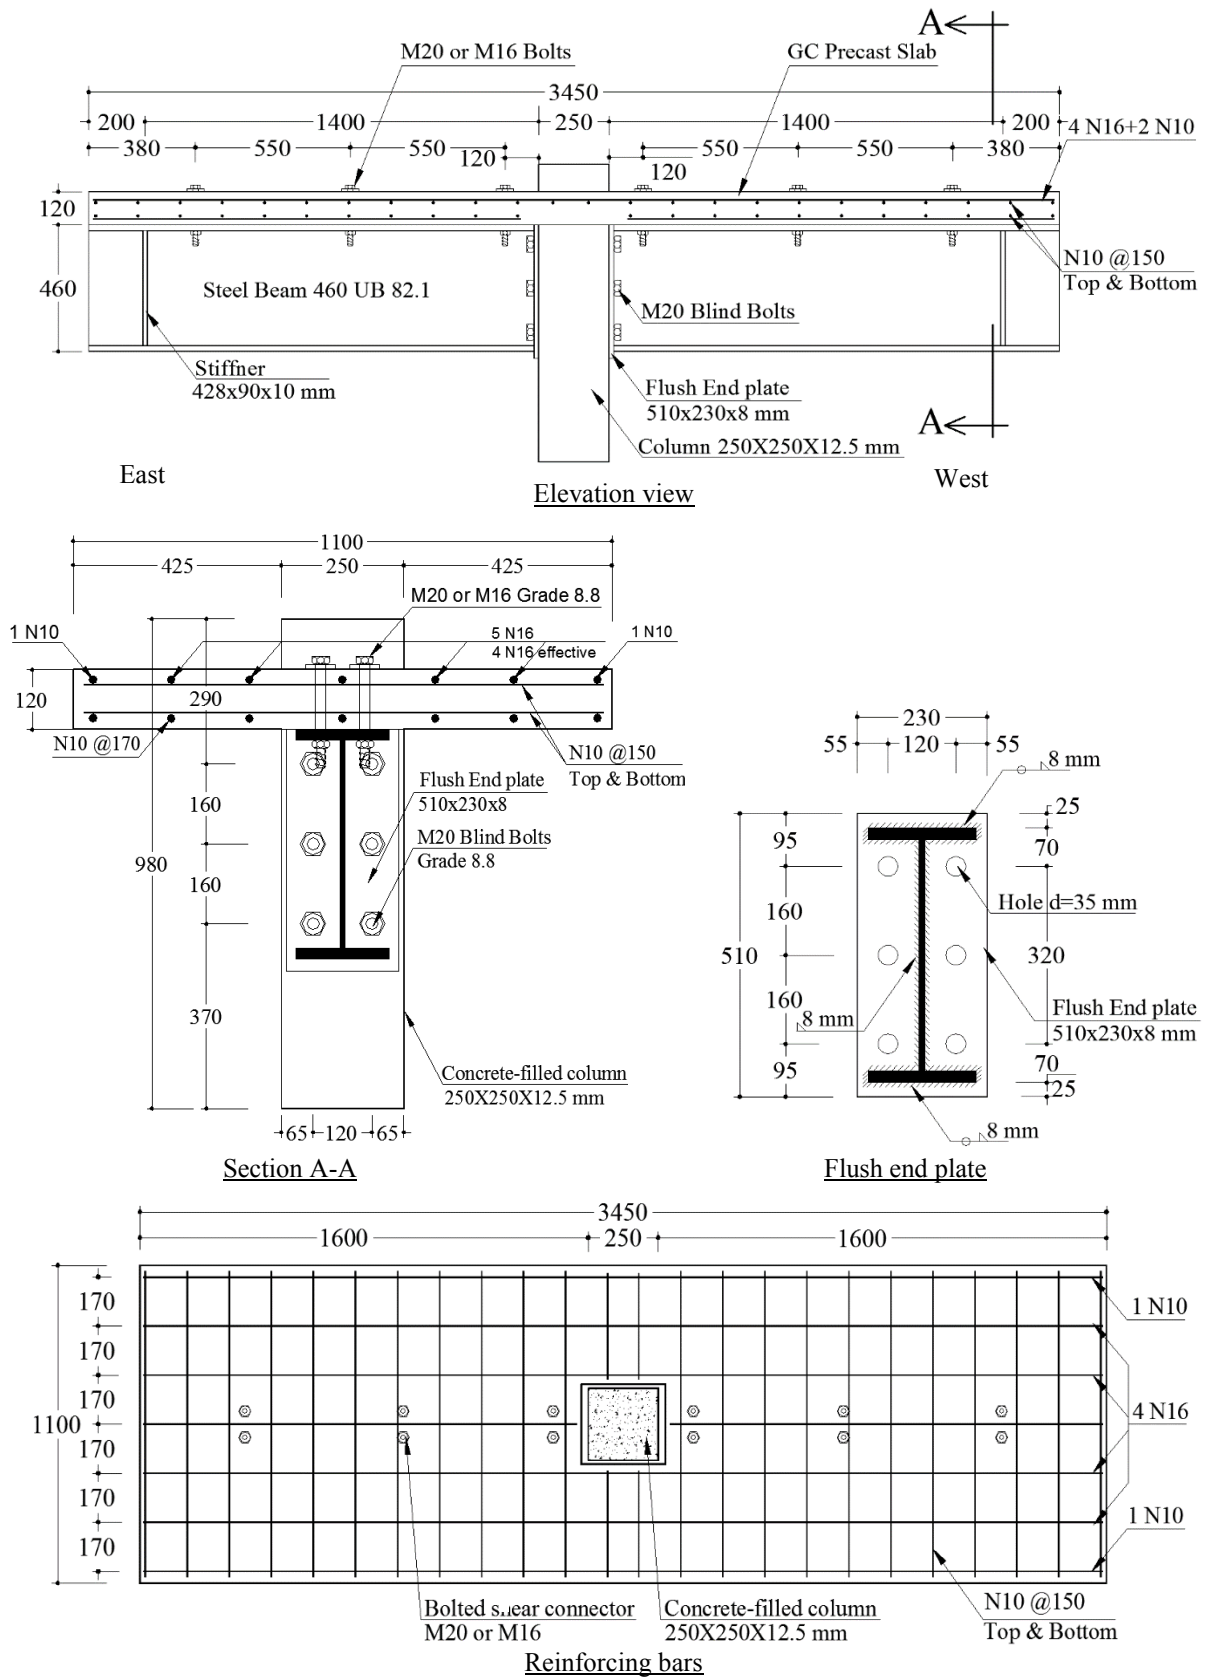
Geometry and details of joints CJ1 and CJ2 (unit: mm).
